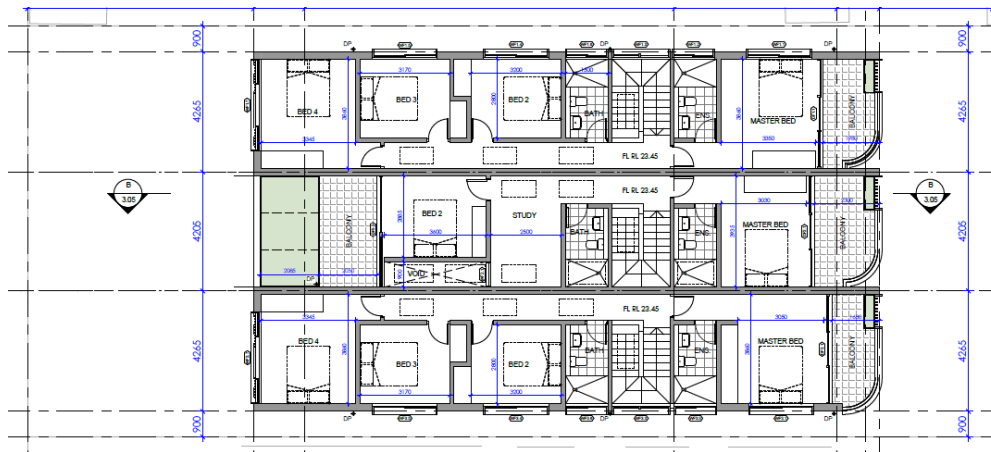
1st floor plan as refused (Source: Bryan Long Group)
